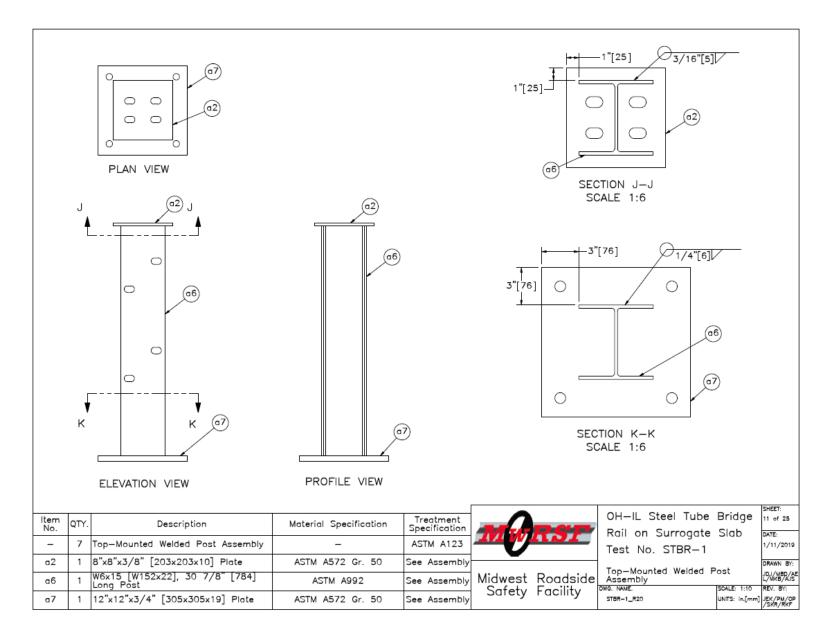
Top-Mounted Welded Post Assembly, Test No. STBR-1
